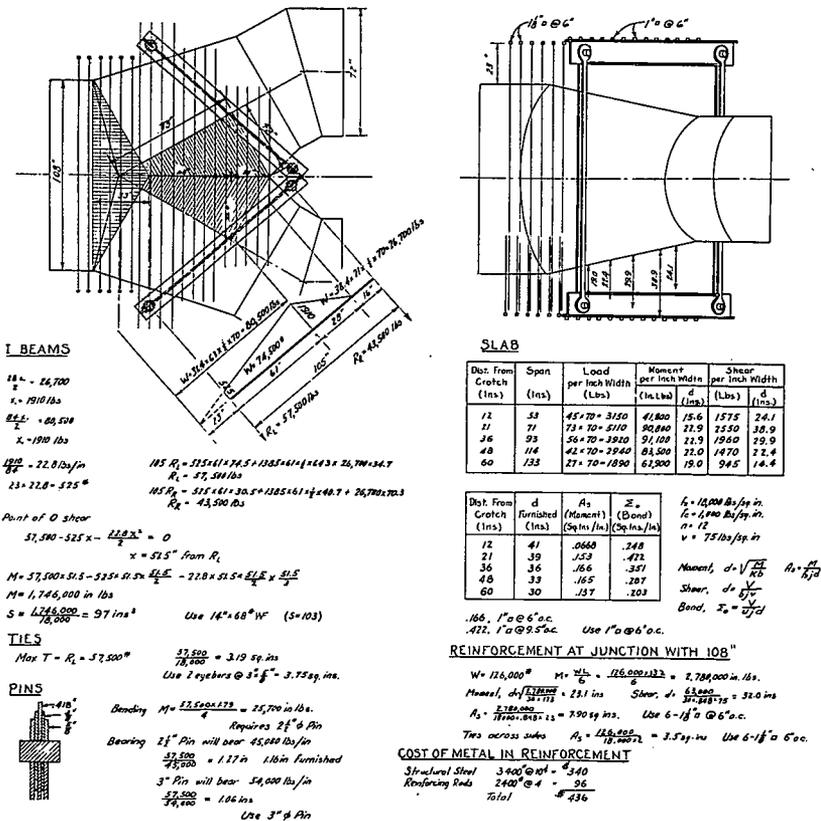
WYE BRANCH, CONCRETE REINFORCEMENT.
